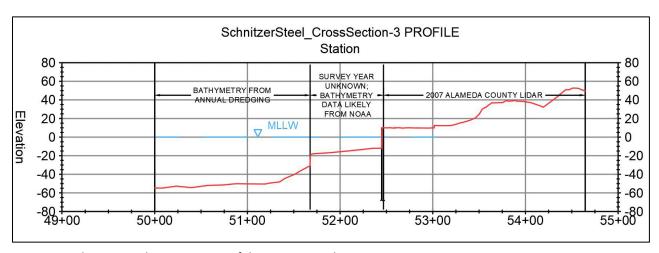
Schnitzer Steel Cross Sections of the Existing Grade
